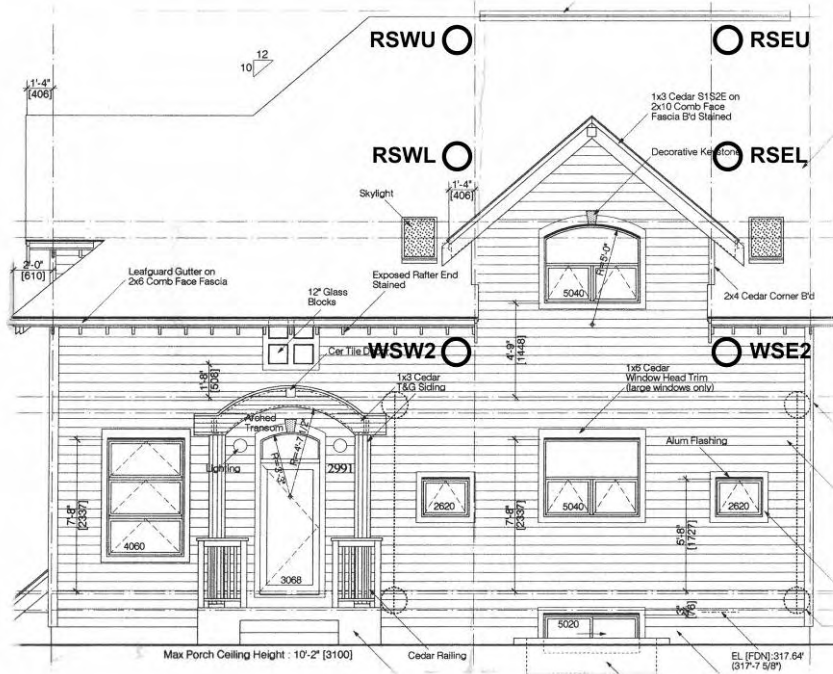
Front (South) elevation of Vancouver test house showing monitoring locations
